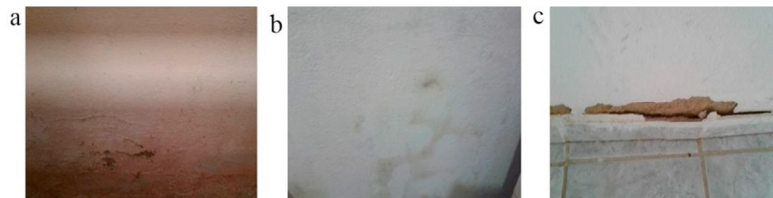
Problems found: (a) Efflorescence, (b) water stain on the wall and (c) coating detachment at the wall bottom.
